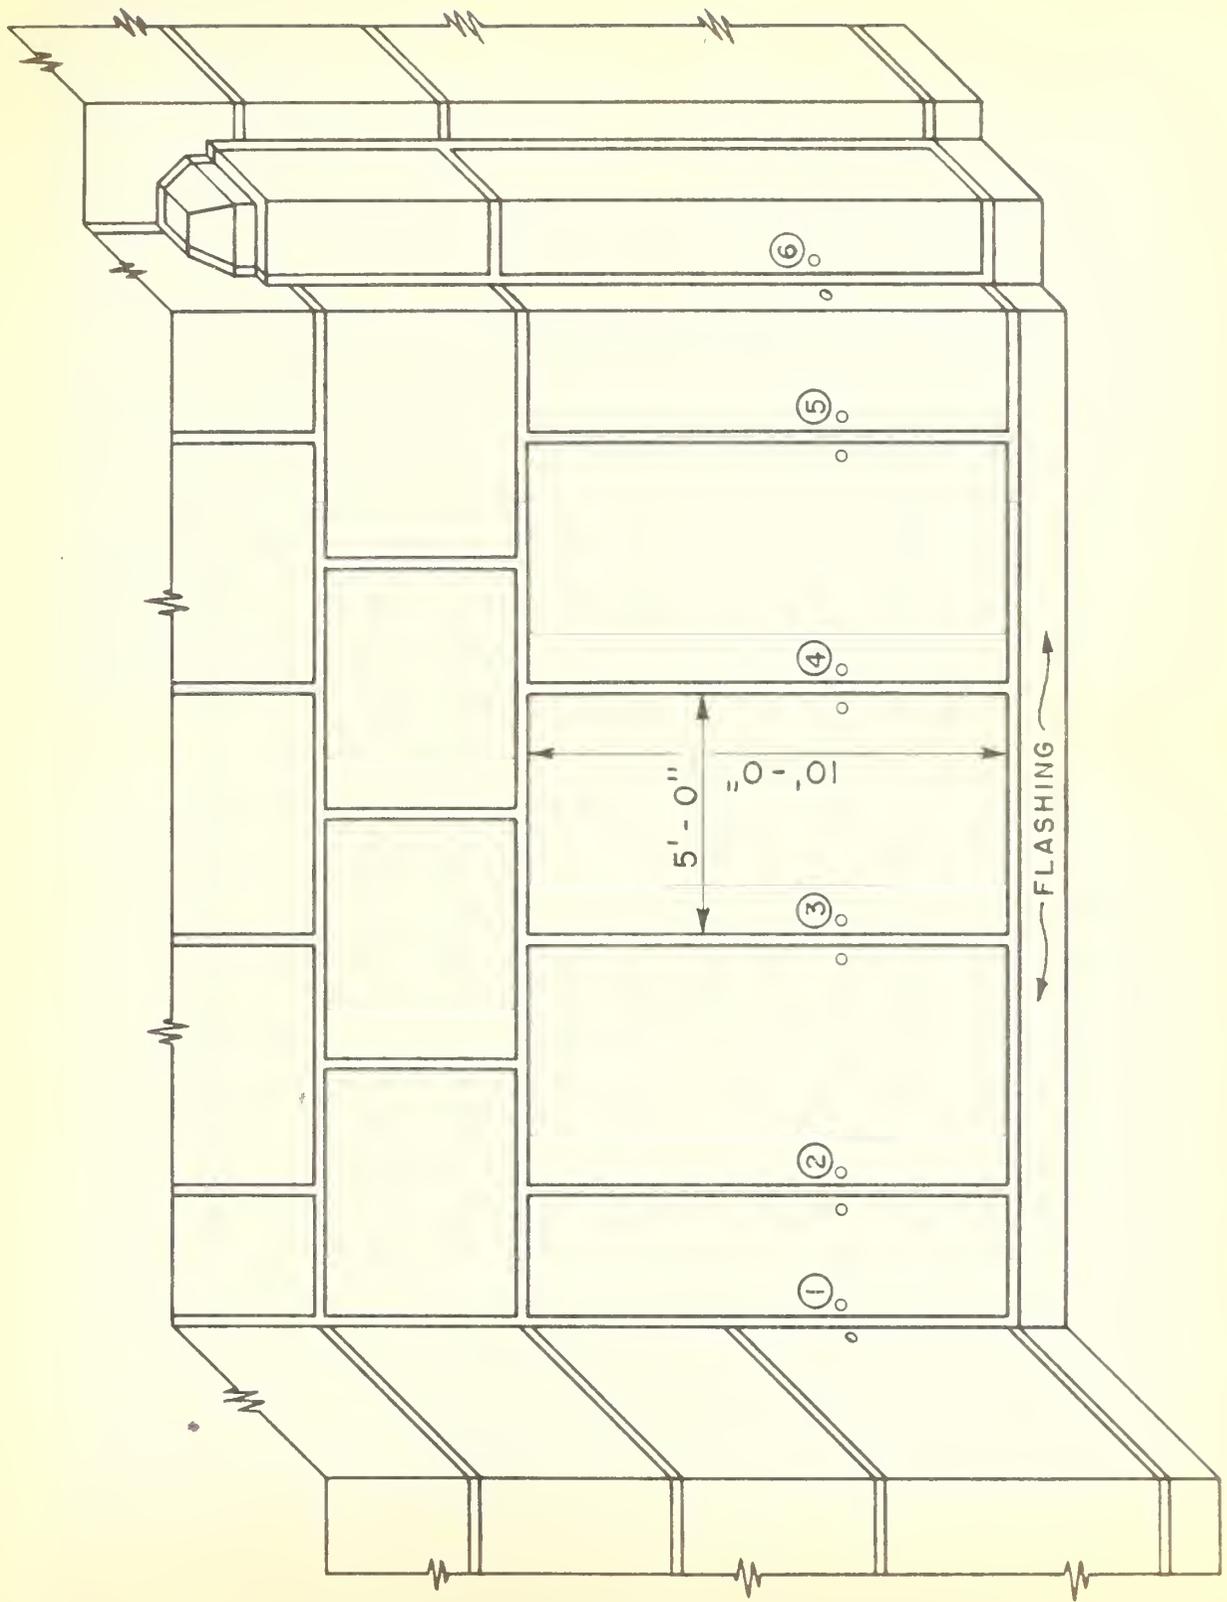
TYPICAL WALL ELEVATION SHOWING LOCATION OF ONE SET OF GAGE STATIONS USED IN MEASUREMENT OF JOINT MOVEMENTS. (19TH FLOOR LEVEL, BUILDING NO. 1, NAVAL MEDICAL CENTER.)
